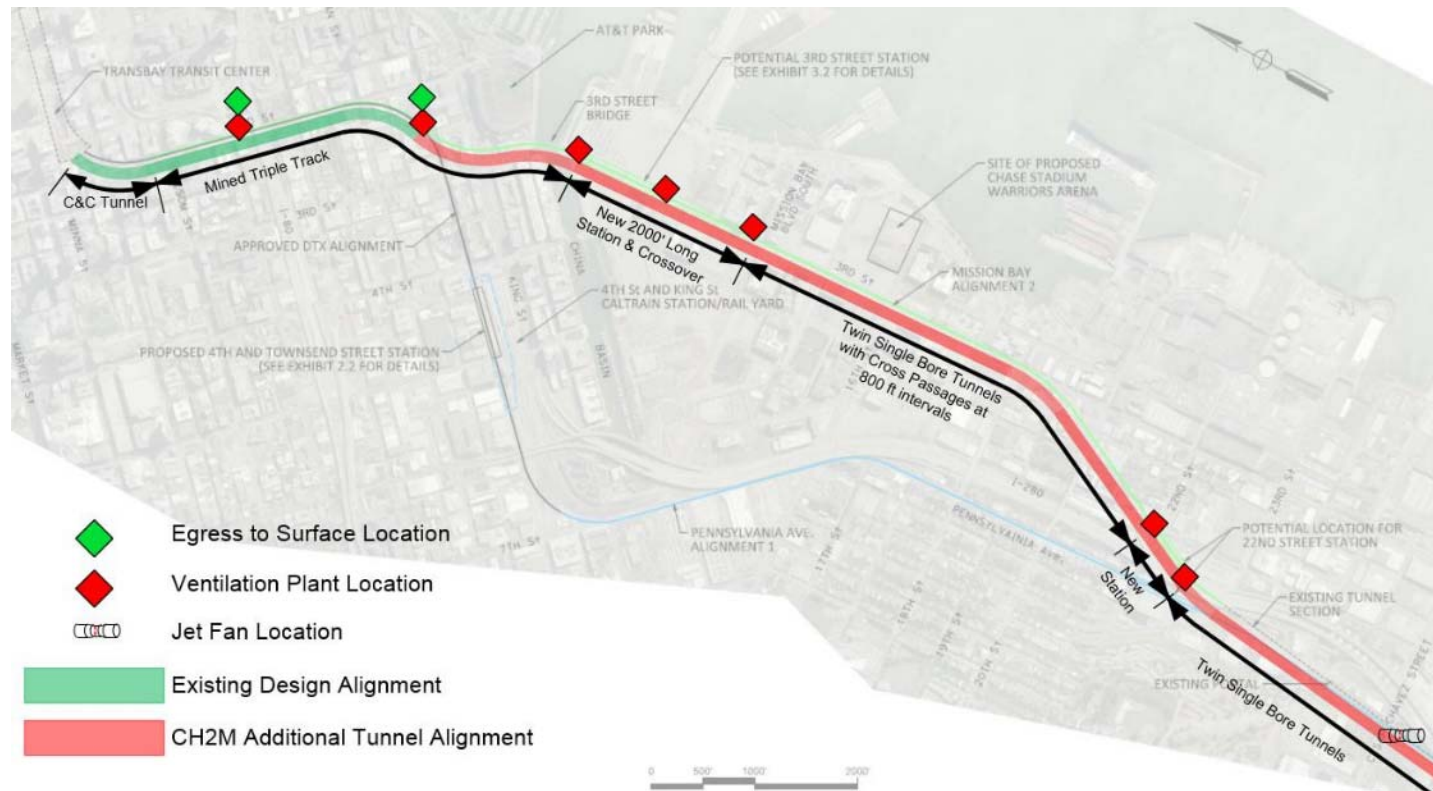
Mission Bay Alignment, Station Alternative 2 Ventilation Plan
